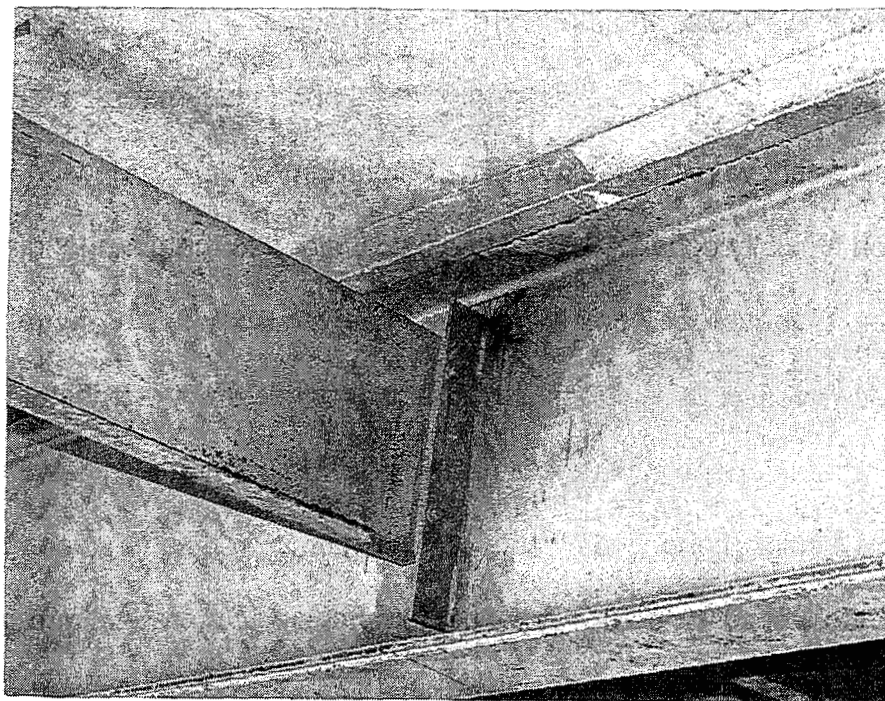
Welded Plate Diaphragm-Girder Connection
